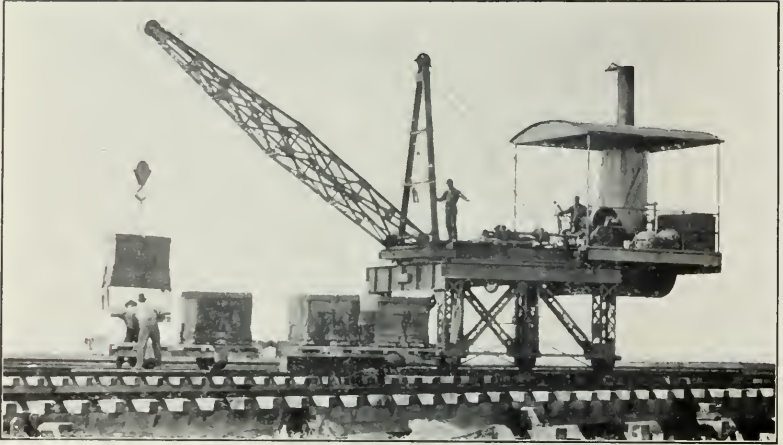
TRAVELING DERRICK HANDLING CONCRETE BLOCKS, DULUTH-SUPERIOR HARBOR.
